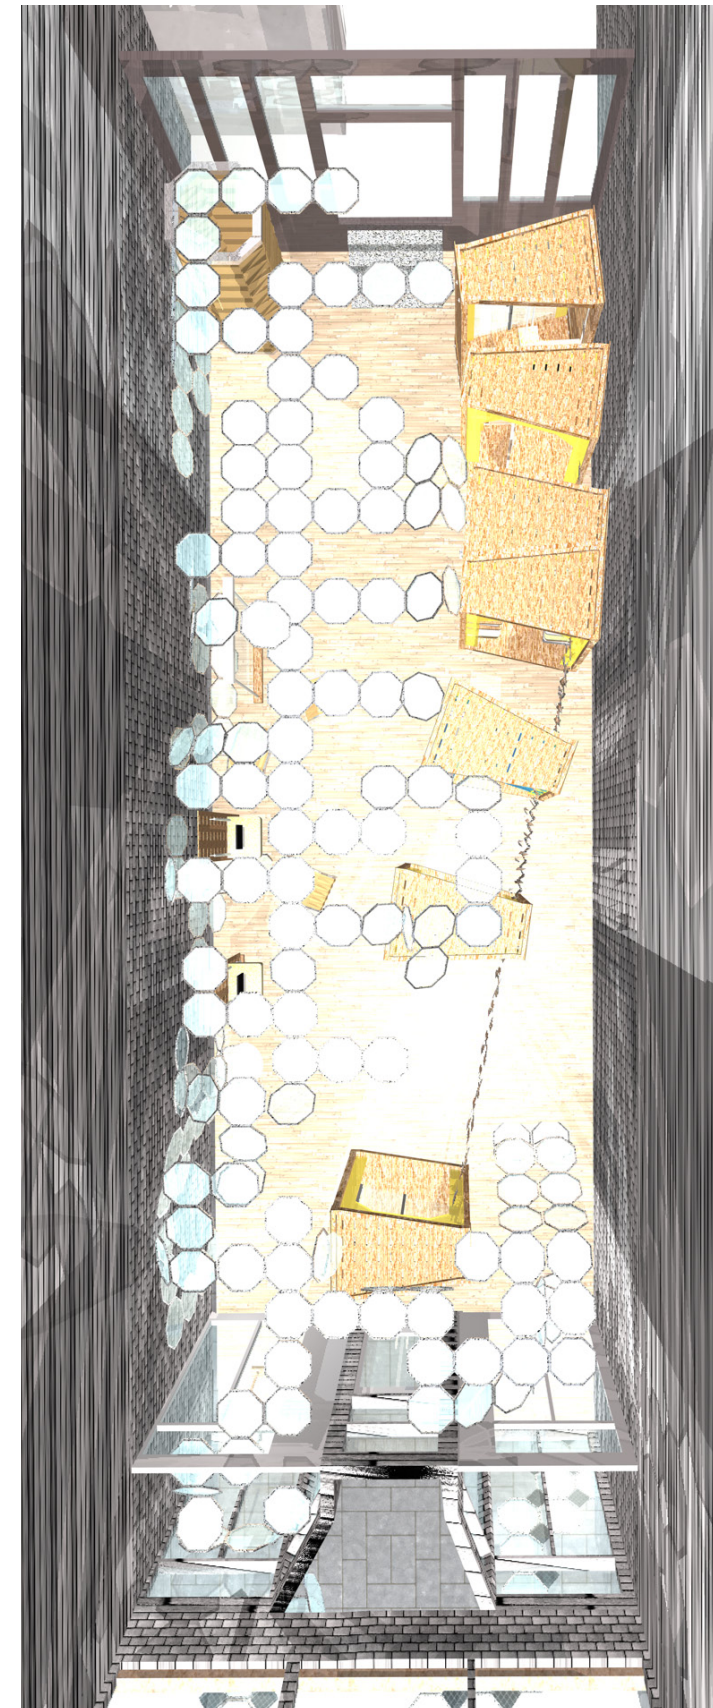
Application One -Plan. (Sosa Fontaine, 2010).
